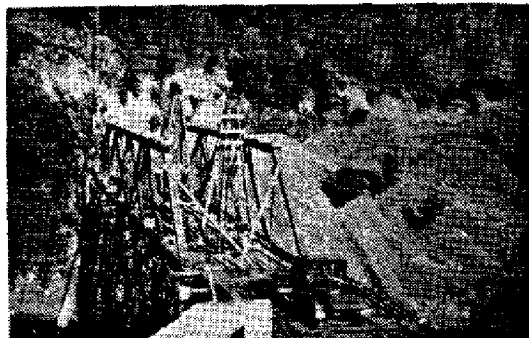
The Howe truss was a common form in timber bridges. Manganuku Bridge was completed in 1928.
